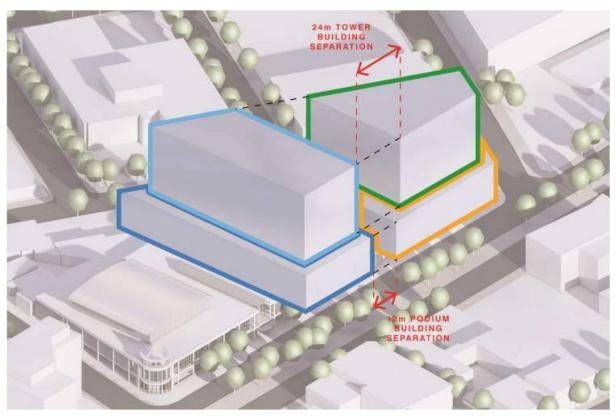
Extract of Plan DA022 showing proposed building separation (Source: Appendix 2)
